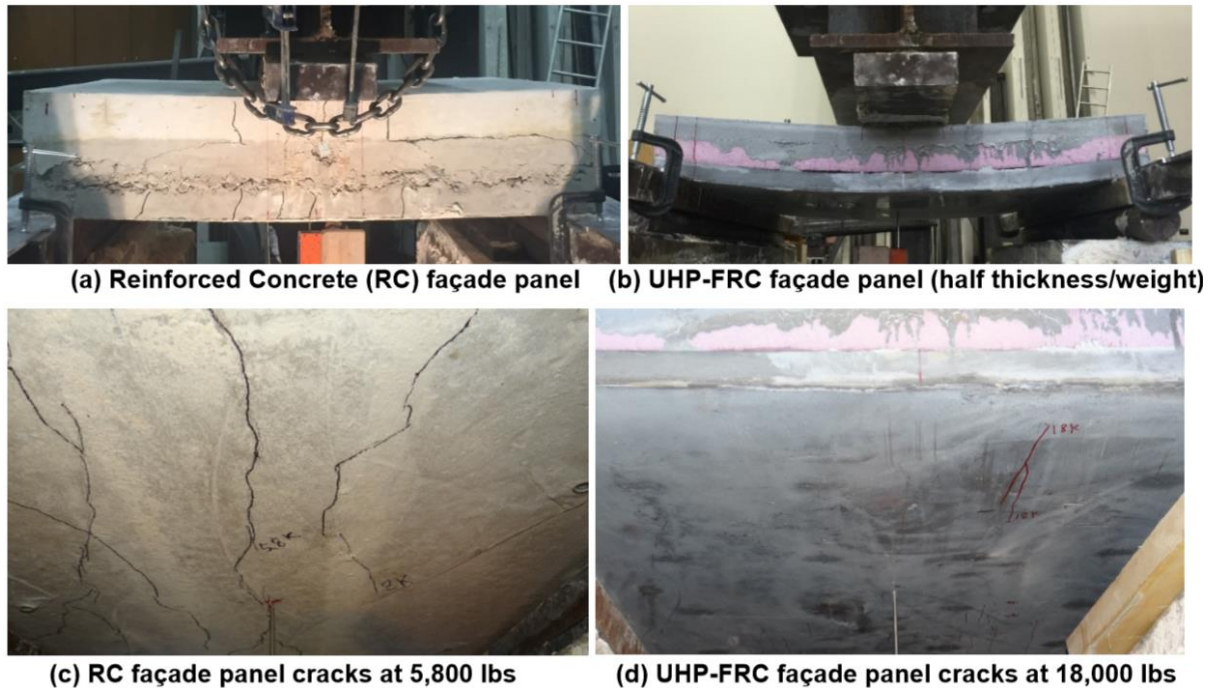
8 Load testing of RC and UHP-FRC façade panels at UTA CELB.
